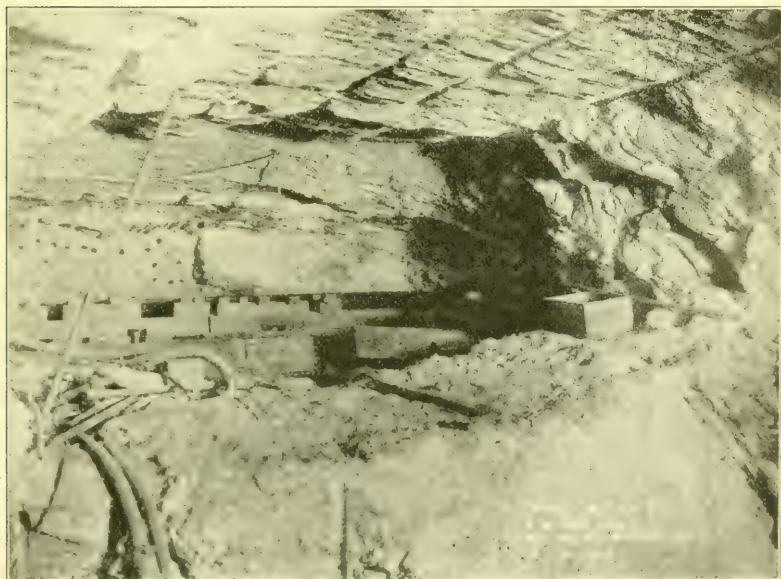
REAR OF SIDE DRIFT, SHOWING OLD ARCH DRILLED. BLOCKING IS SHOWN UNDER ARCH RESTING ON SHIELD.
